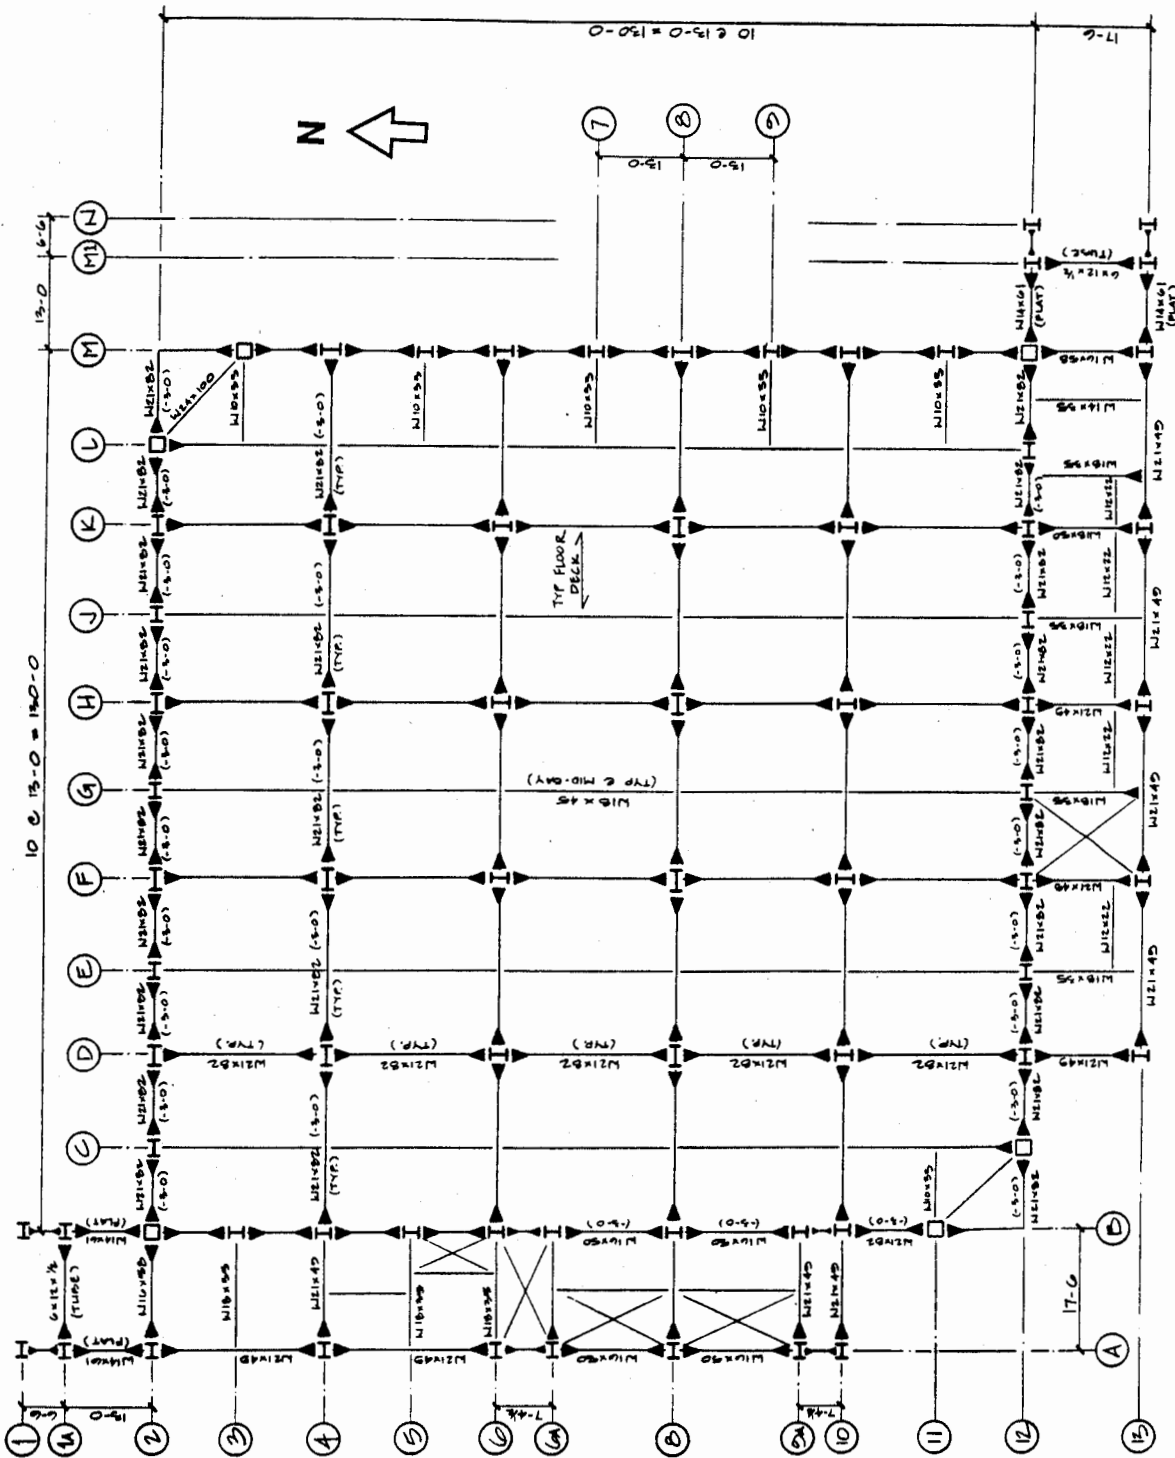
Santa Clara County Government Center - San Jose Framing Plan (Typical)
